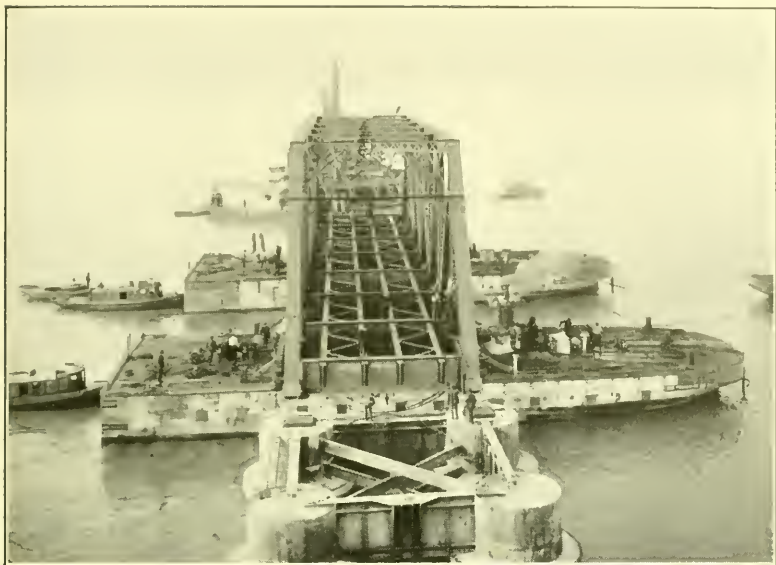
FLOATING SPAN 5 INTO POSITION, DUMBARTON POINT BRIDGE.
